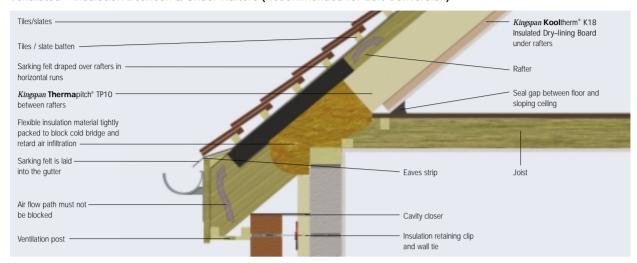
Overhanging Eaves Detail - Section Perpendicular to Ridge
